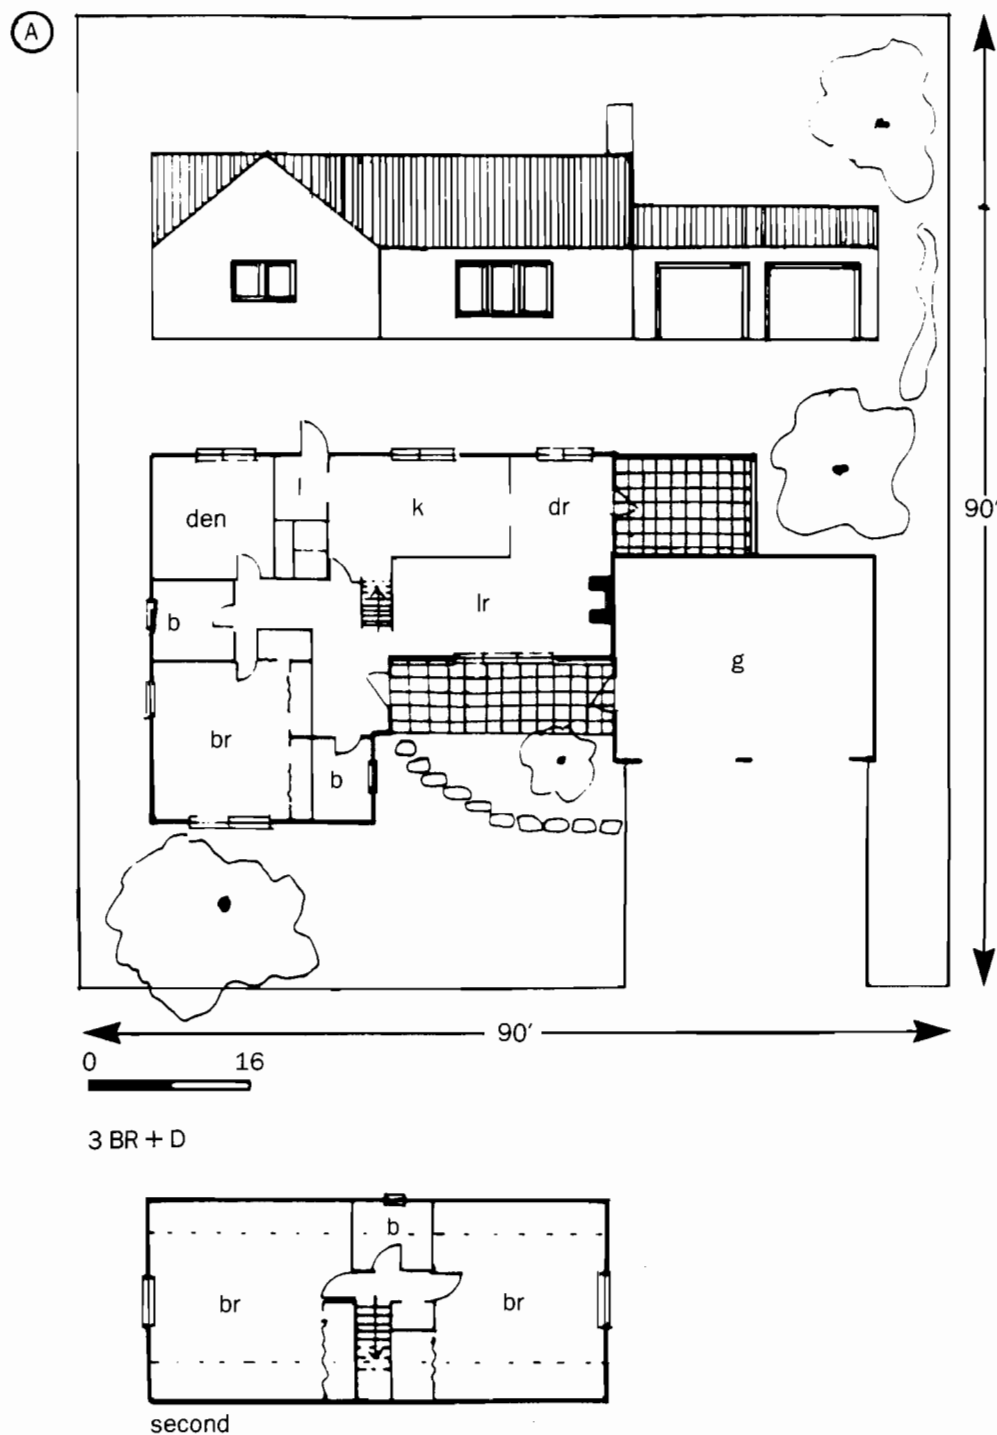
A Suburban single-family house, plan, three bedrooms plus den
